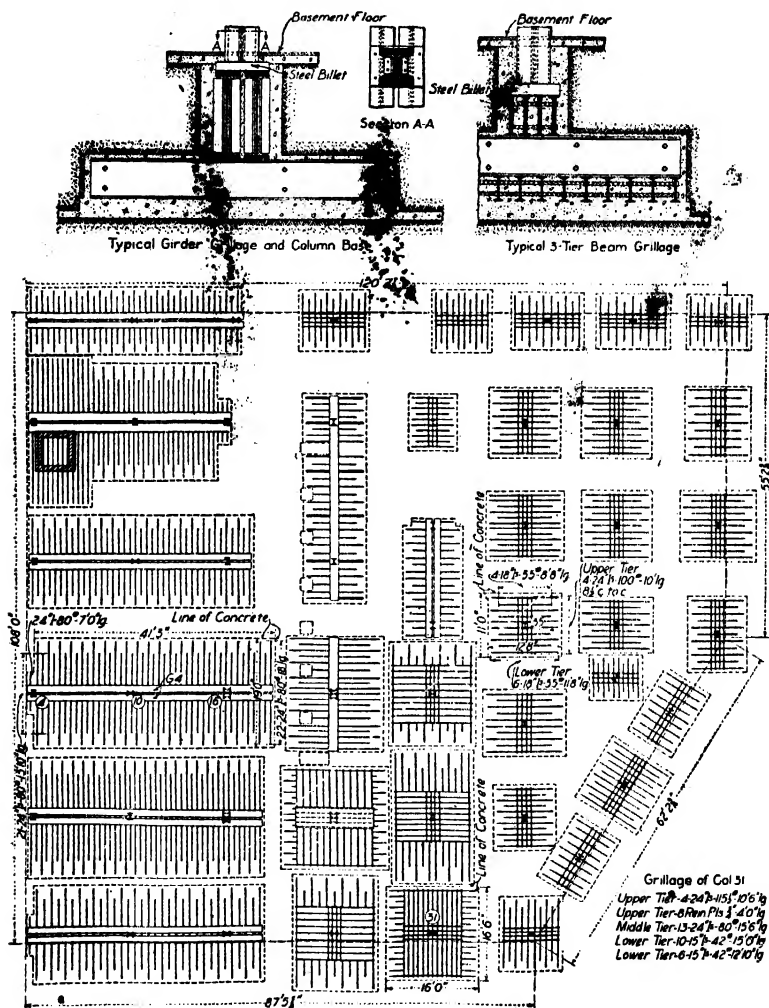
(a).—Grillage foundation of the L. C. Smith Building, Seattle.
